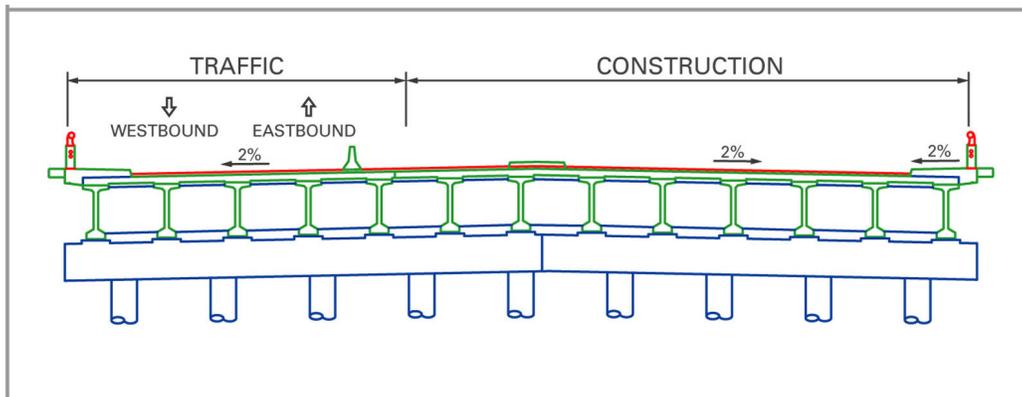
Stage Three – Construction of Remaining Portion of Proposed Bridge
